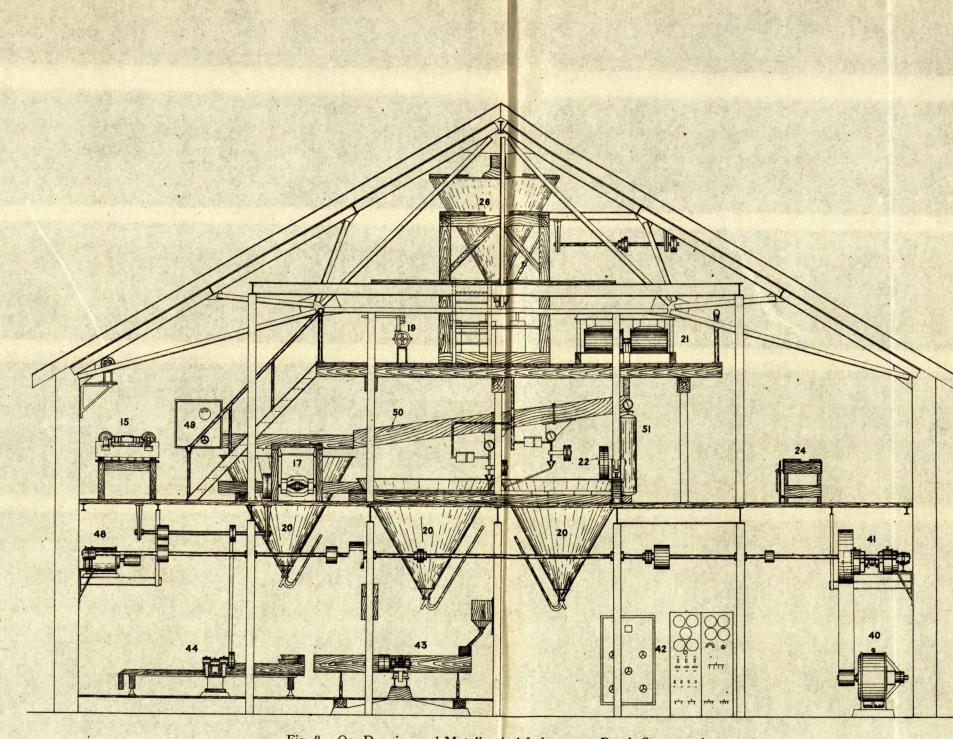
, Ore Dressing and Metallurgical Laboratory, Booth Street and Plymouth Avenue, Ottawa. Section on C-D, looking west.
